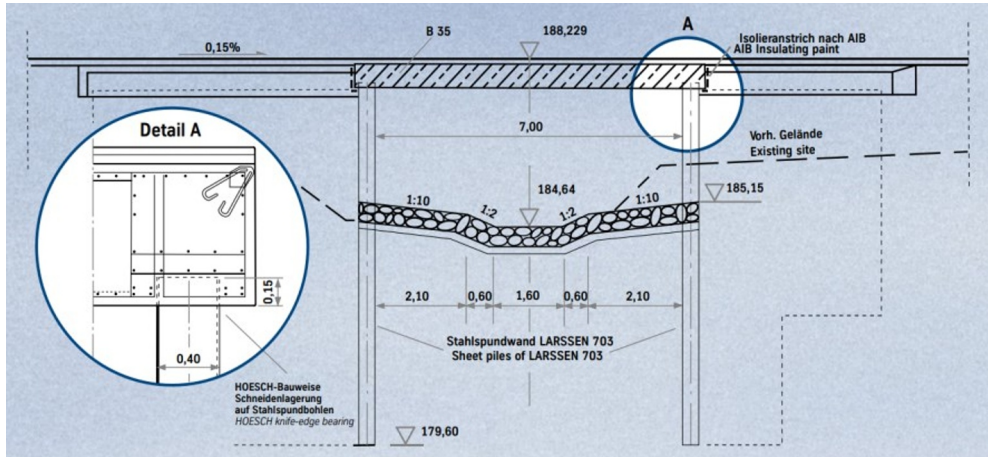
Bridge with a 7m span, Beverungen, Germany (knife-edge bearing).
